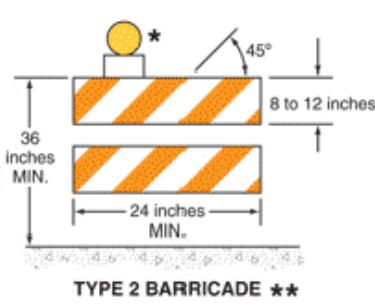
F-7 CHANNELIZING DEVICES - SIDEWALK BARRICADE
